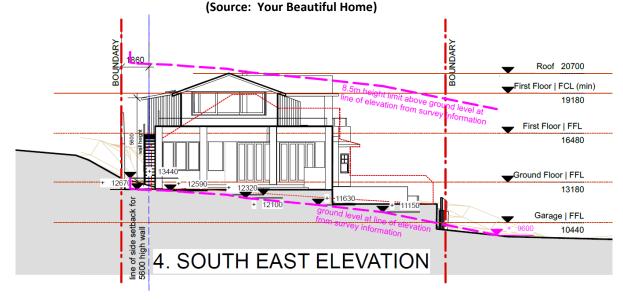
South-east elevation indicating proposed roof complying with Council's Height of Buildings control above surveyed external ground levels (Source: Your Beautiful Home)
